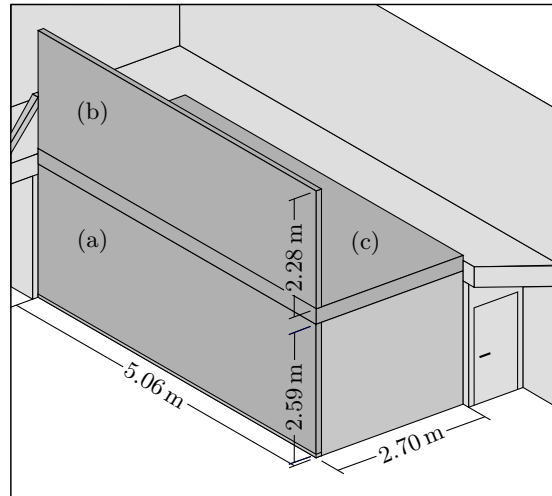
Sketch of the laboratory test structure. In the following the walls and the floor are denoted as: (a) Lower (timber-frame) wall, (b) upper (timber-frame) wall and (c) (timber-joist) floor.
